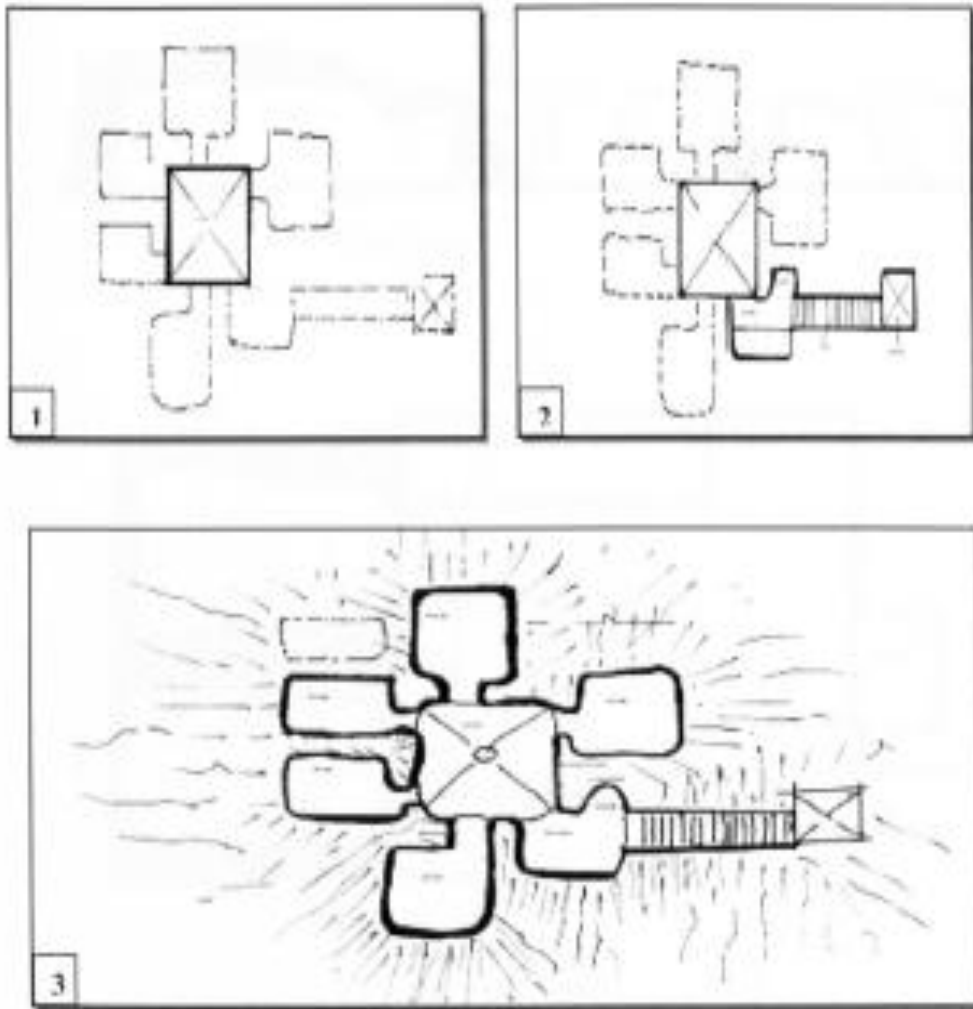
The Construction Stages of Underground Houses in the Mountain Area - (Source: Amer, 2007)
